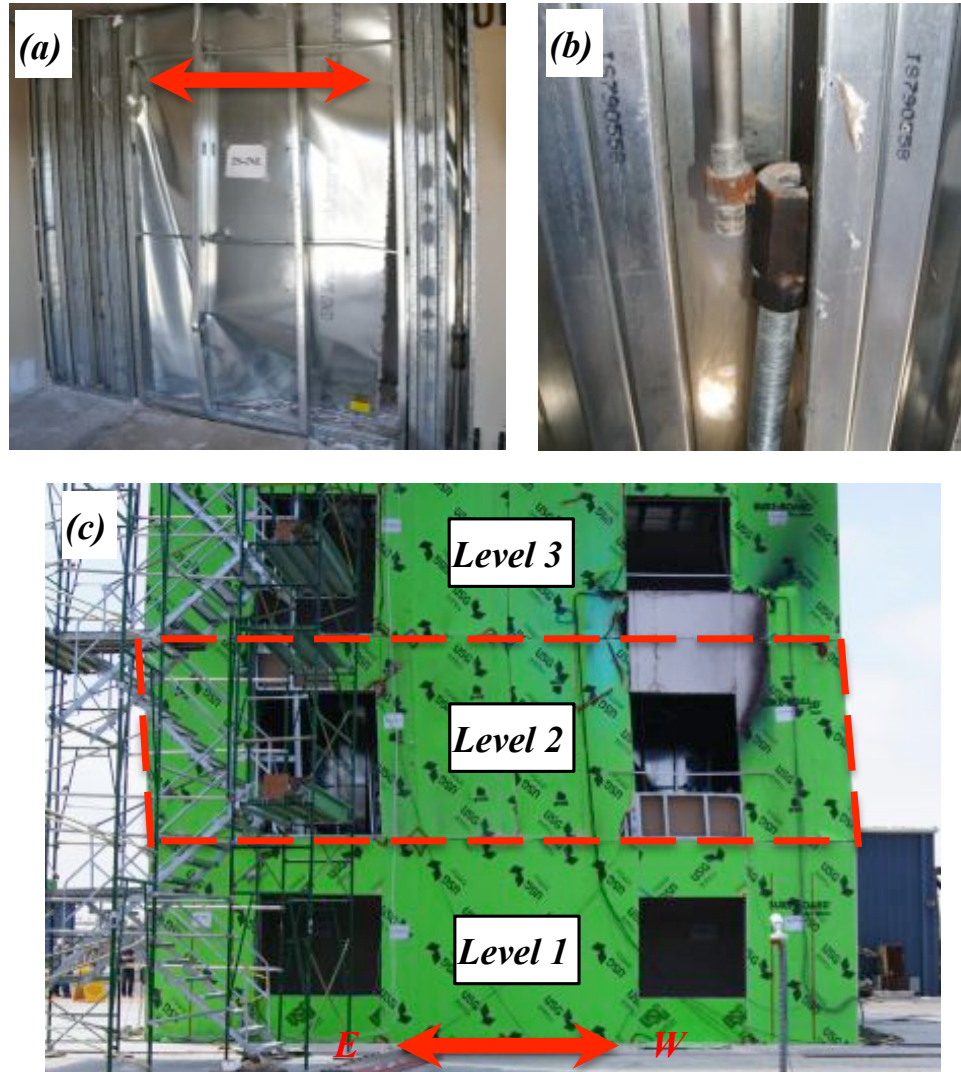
Damage of the test building at the completion of the test program: (a) severely damaged corridor shear wall at level 2, (b) dislodged tension rods at the corner shear wall at level 2 (southeast room), and (c) north façade of the building at the lower three levels with apparently residual drifts at level 2.
